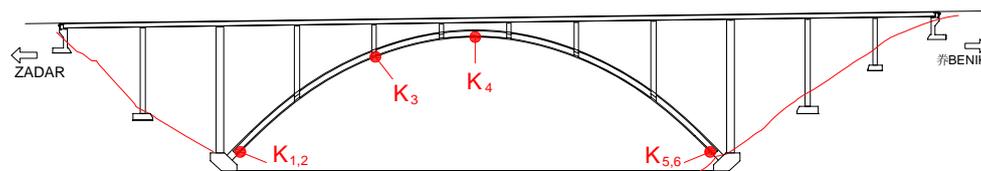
Location of corrosion sensors installed on Skradin Bridge
